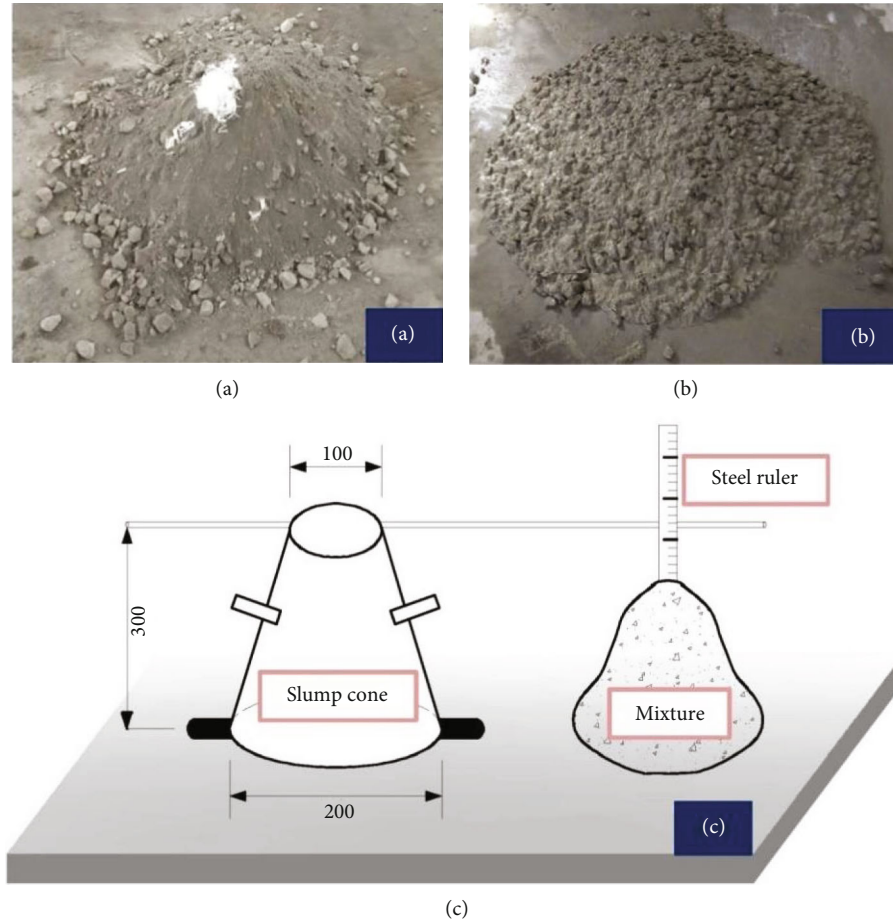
Concrete mixture and geometric diagram of slump cone.
